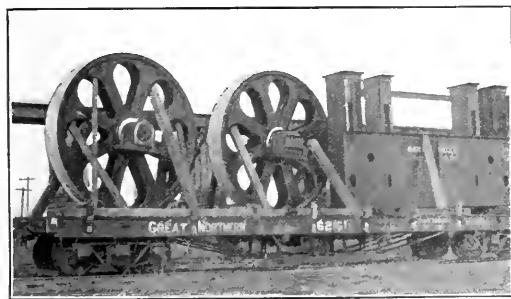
TWO 12-FT. CAST-STEEL SHEAVES AND SUPPORTING GIRDER, MISSOURI RIVER BRIDGE AT MONDAK, MONT.
